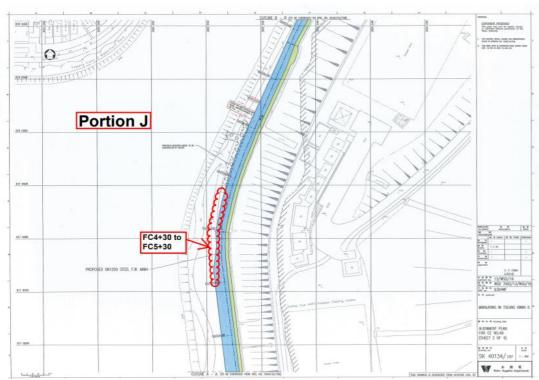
Location Plan for Portion J – Landfill Stage 1 (FC4+30-FC5+30)
